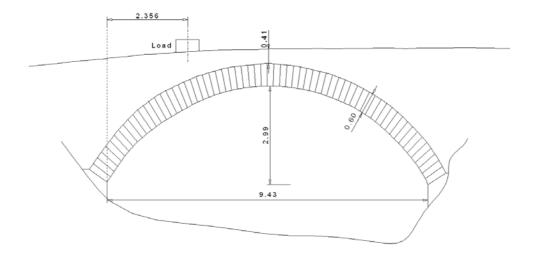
Strathmashie Bridge - 9.43m Random Rubble Arch
